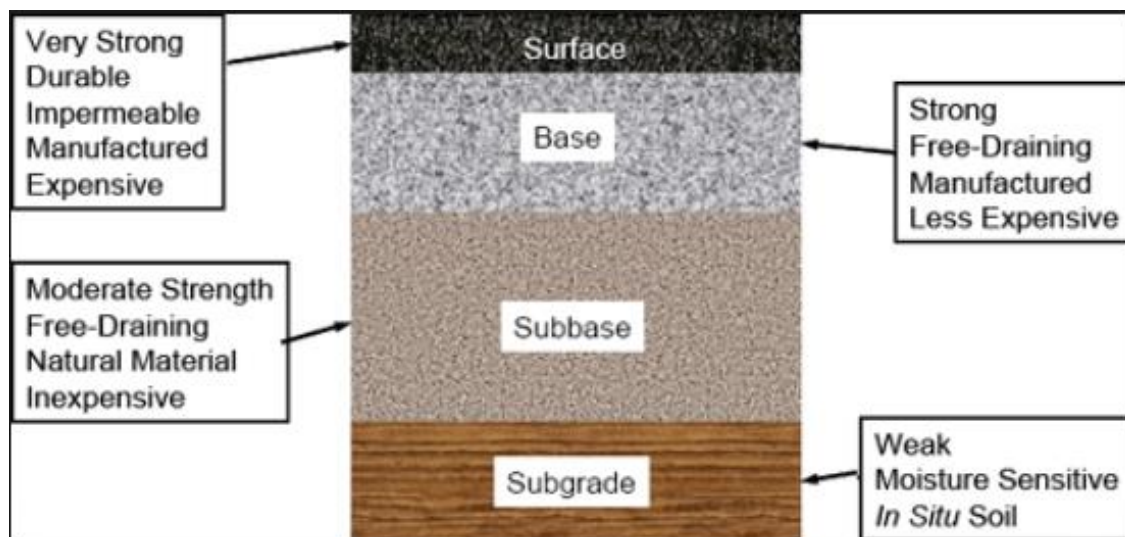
1: Typical pavement structure layers (FHWA 2017)
